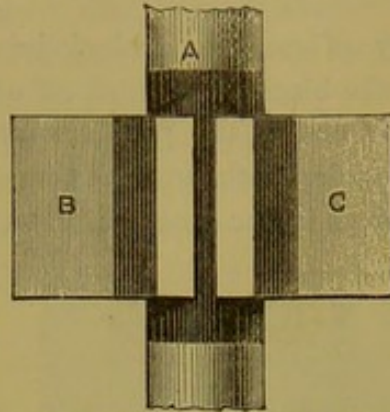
Pair of Tacks soldered to a Pipe—back view.
